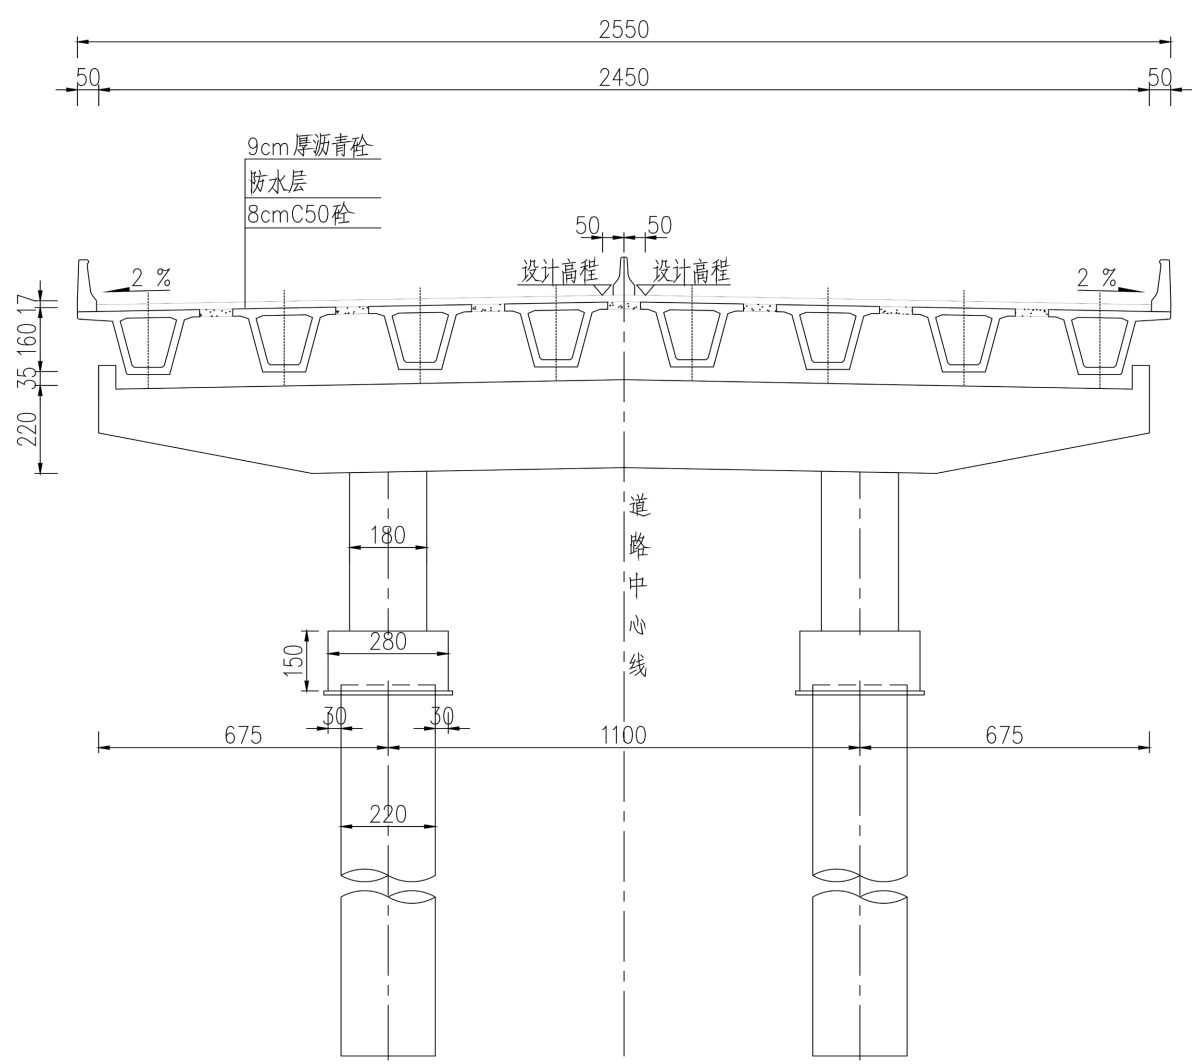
Cross-section arrangement diagram of precast prefabricated small box beam
